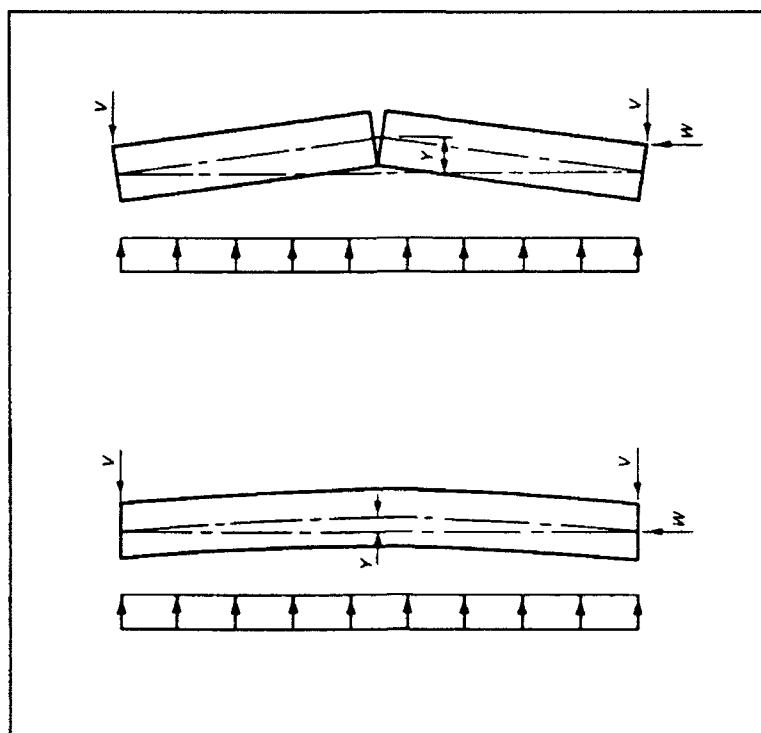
Assumed response of unreinforced masonry wall to uniform load
